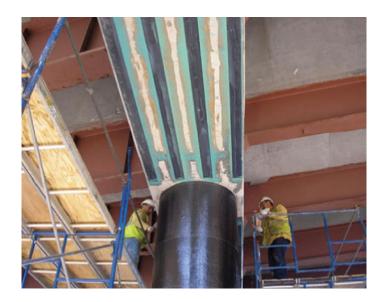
FRP in repair of concrete bridge (Ma et al., 2017)
